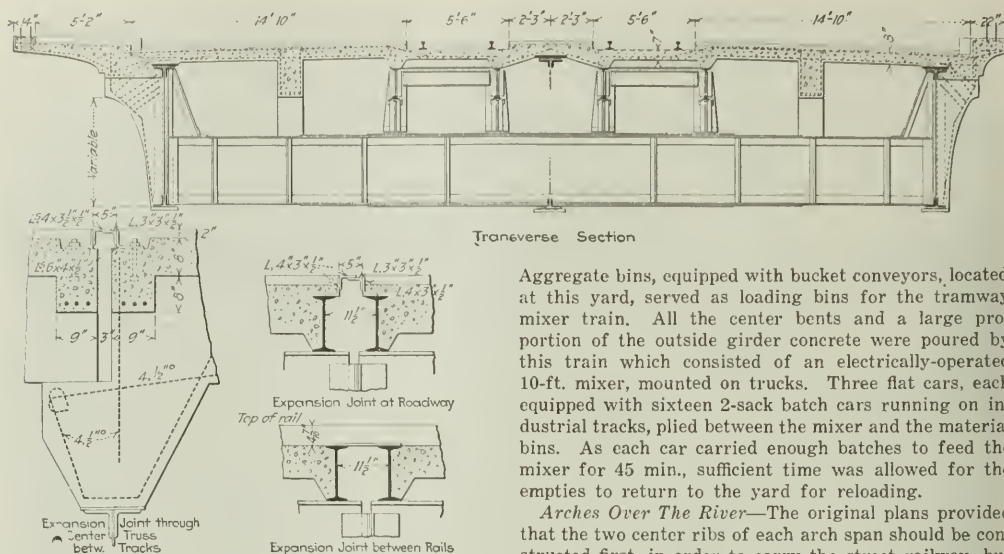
FLOOR AND EXPANSION JOINTS AT "TERMINAL SECTION"
